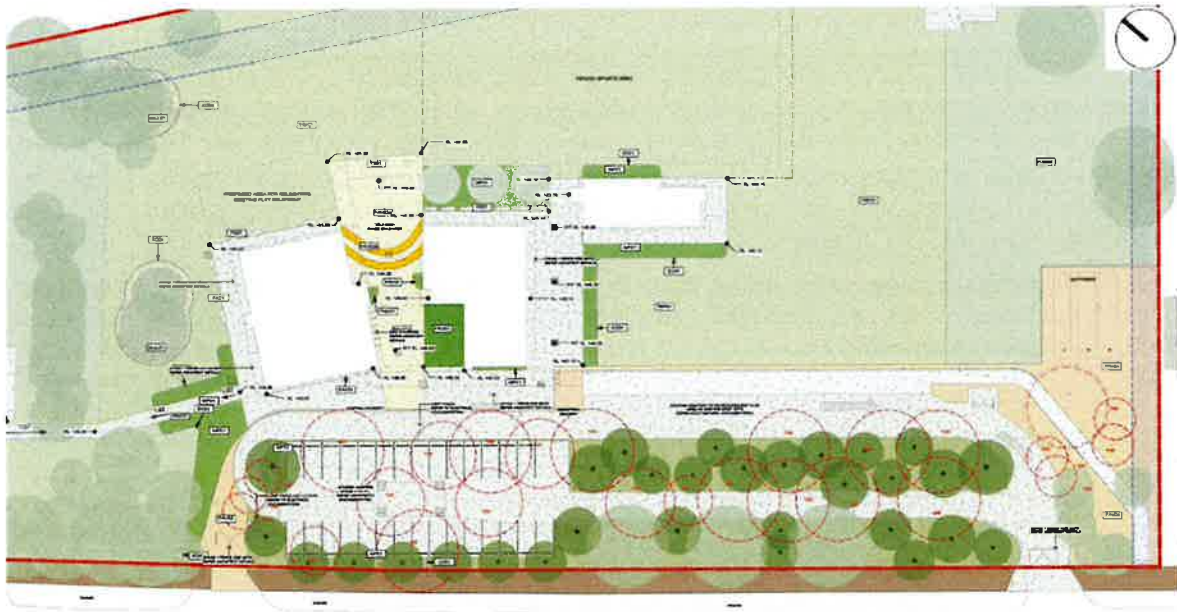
Stage 1\_Level & Finishes Plan (Source: NBRs)
